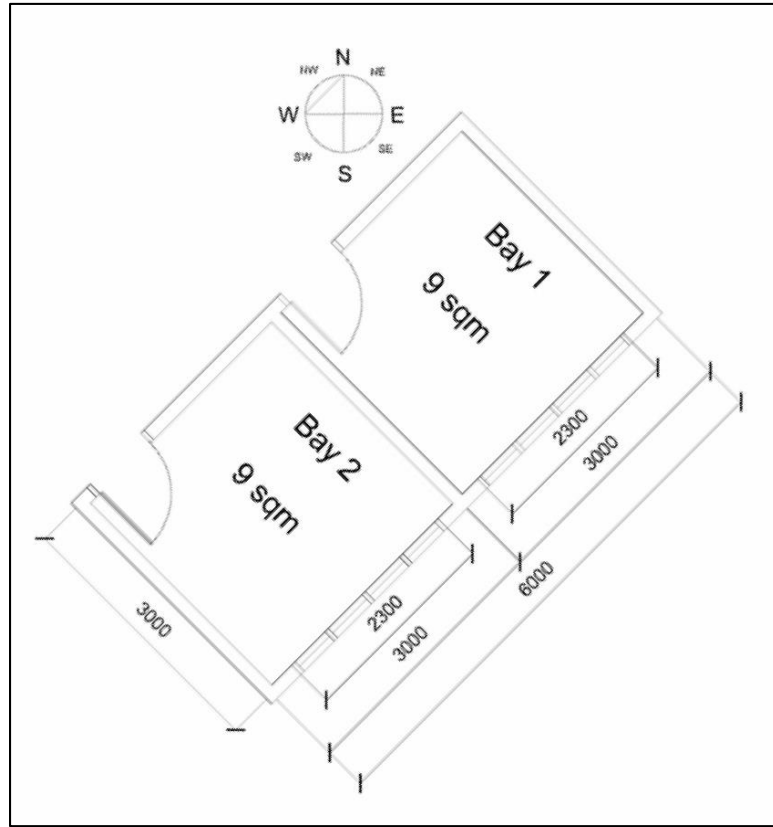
Classroom *Tasmi'* 1 Floor Plan
